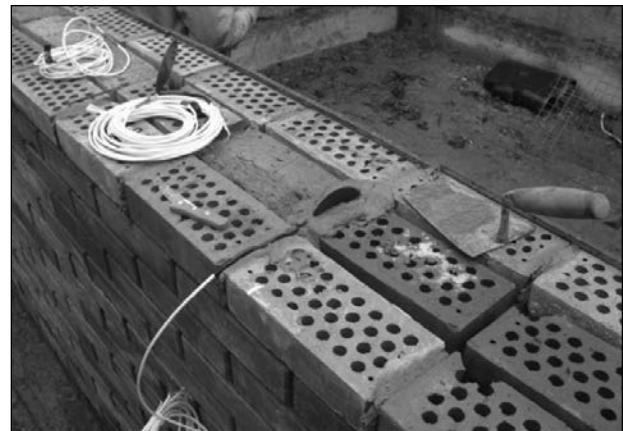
Examples of sensors mounted in the walling of pilot passive-type house
